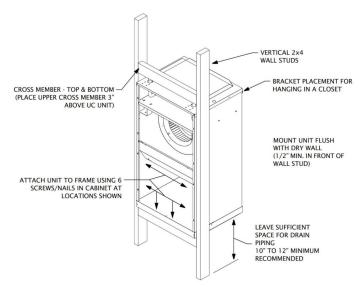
UC-HW RECESSED WALL MOUNTING (SUPPORT FRAMING)
